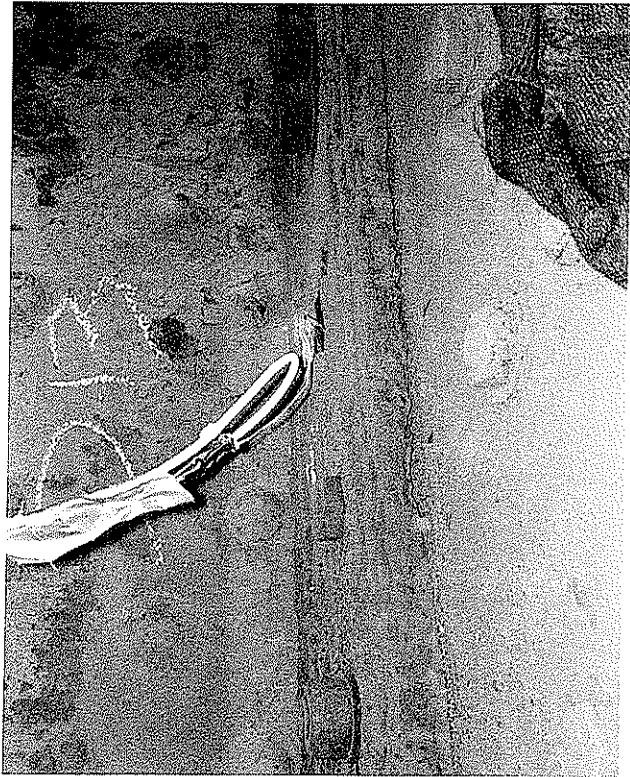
Span 2; December Gage Installations at Floorbeam 5
